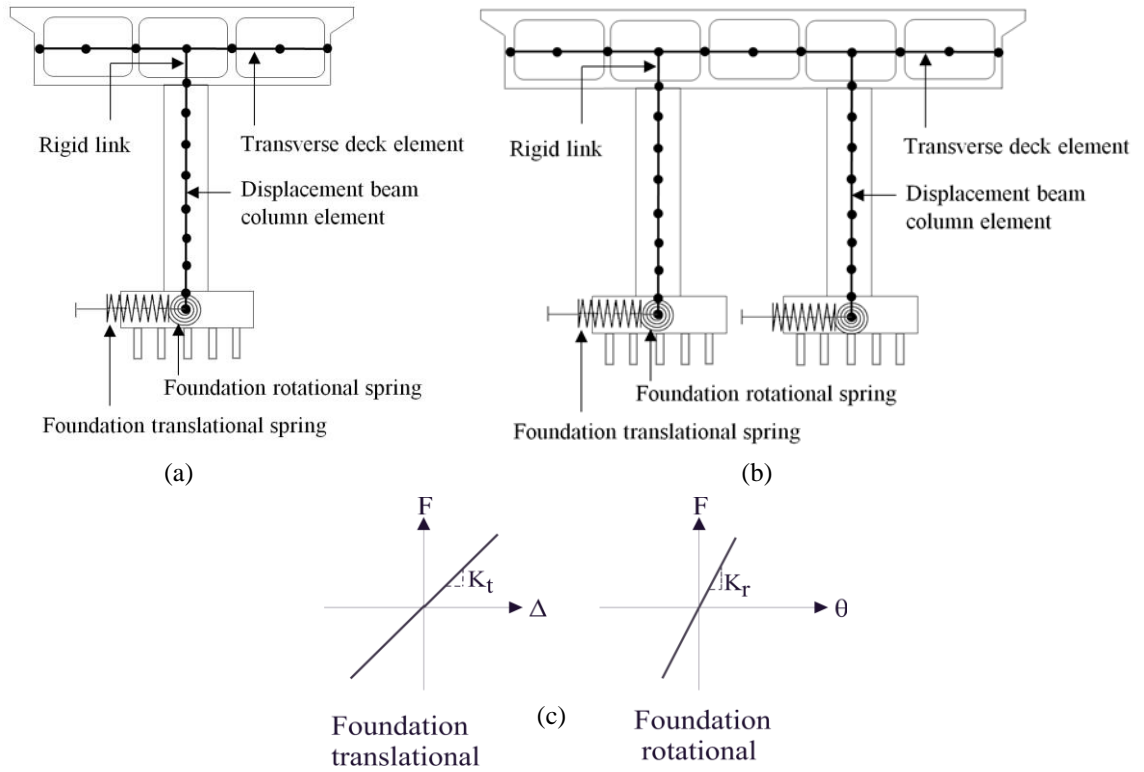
Bridge foundation elements added to the base of the columns; (a) single column bent; (b) multi-column bent; and (c) force-displacement of foundation elements
